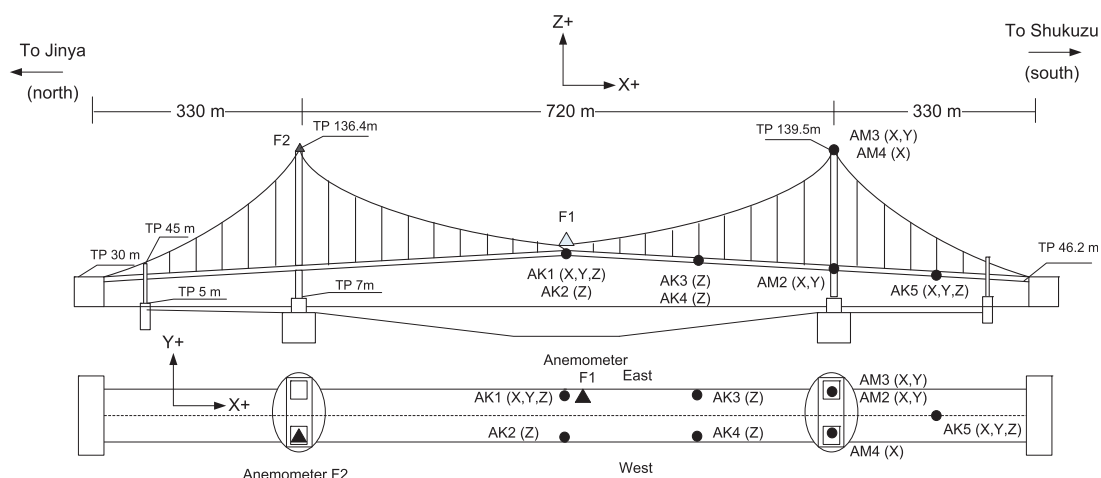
Hakucho Suspension Bridge monitoring system. Note: Accelerometers AK are placed on girder and AM on tower. X, Y, Z denote the measuring directions, F1 and F2 are the anemometers (F1 is on the east side of the center span and F2 is on the west leg of north tower).
